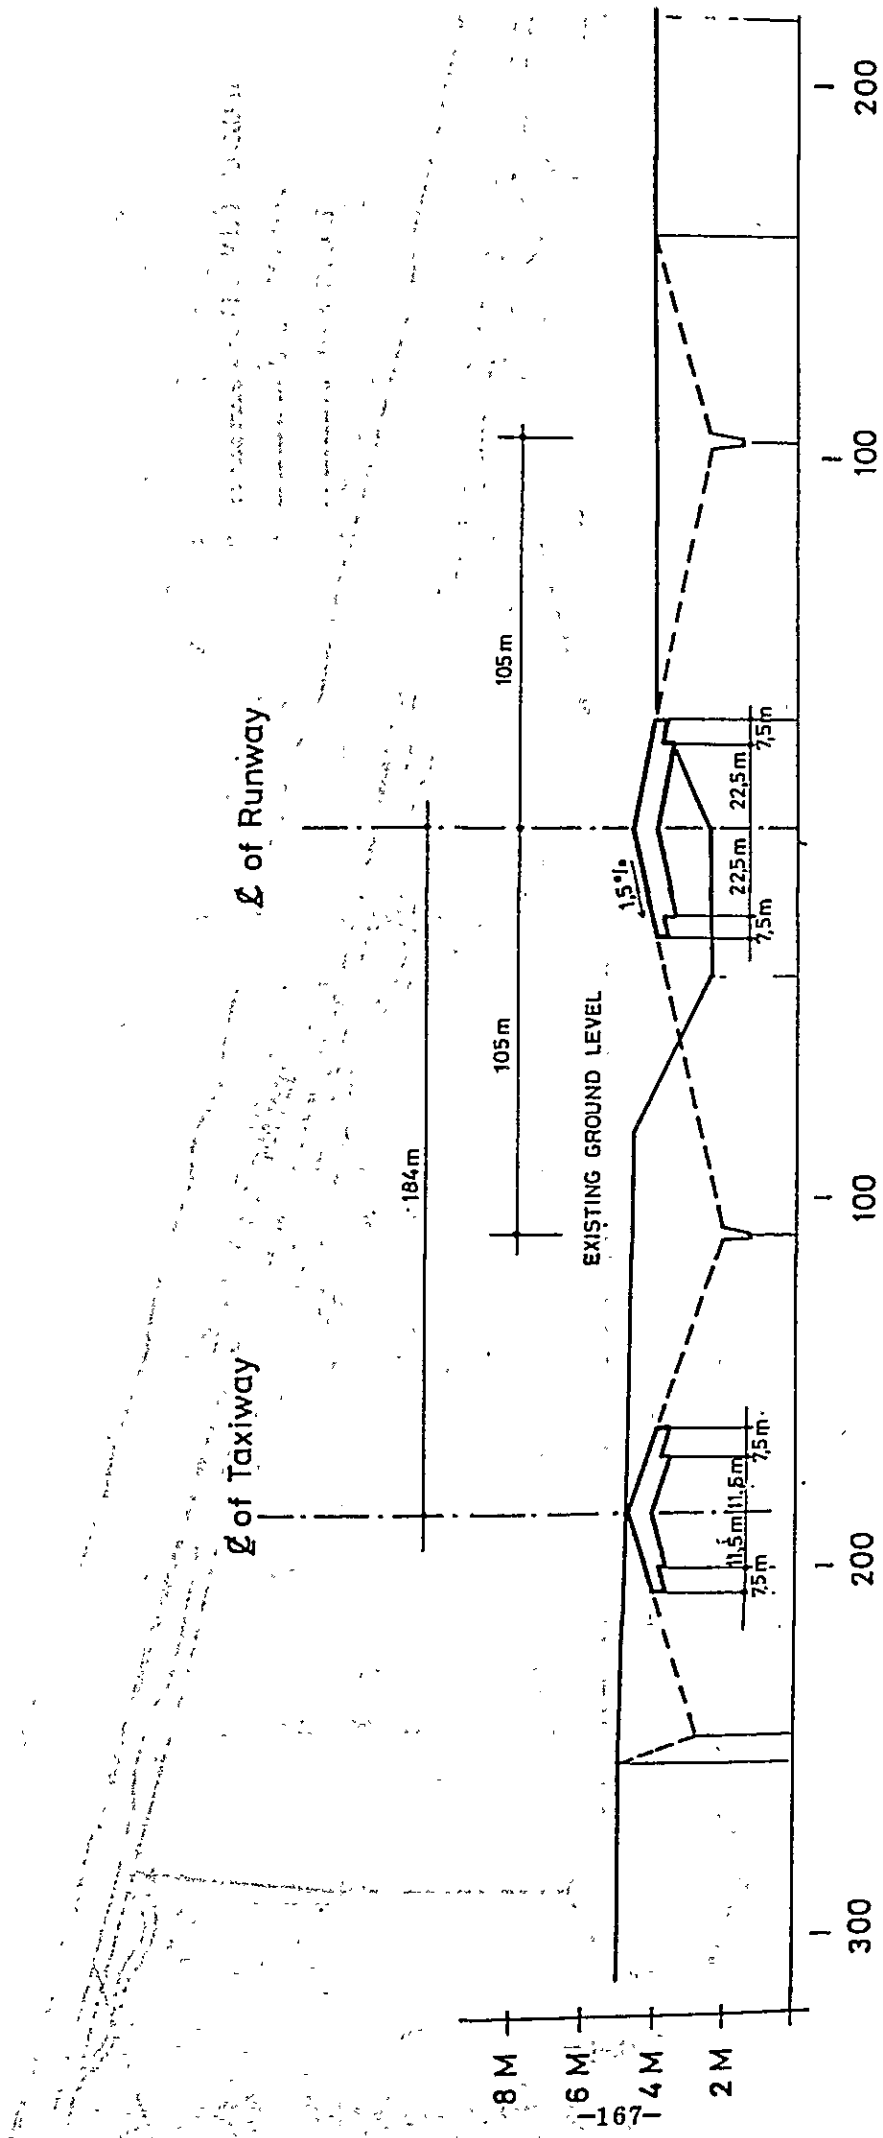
TYPICAL CROSS SECTION AT KETAPING
